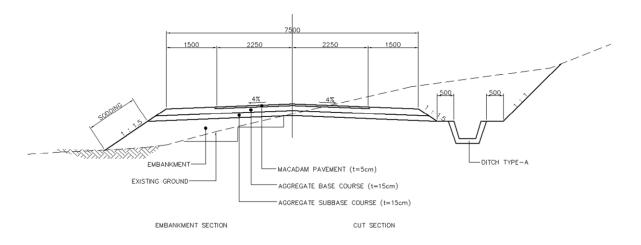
Typical Cross Section of Bridge Approach Road
